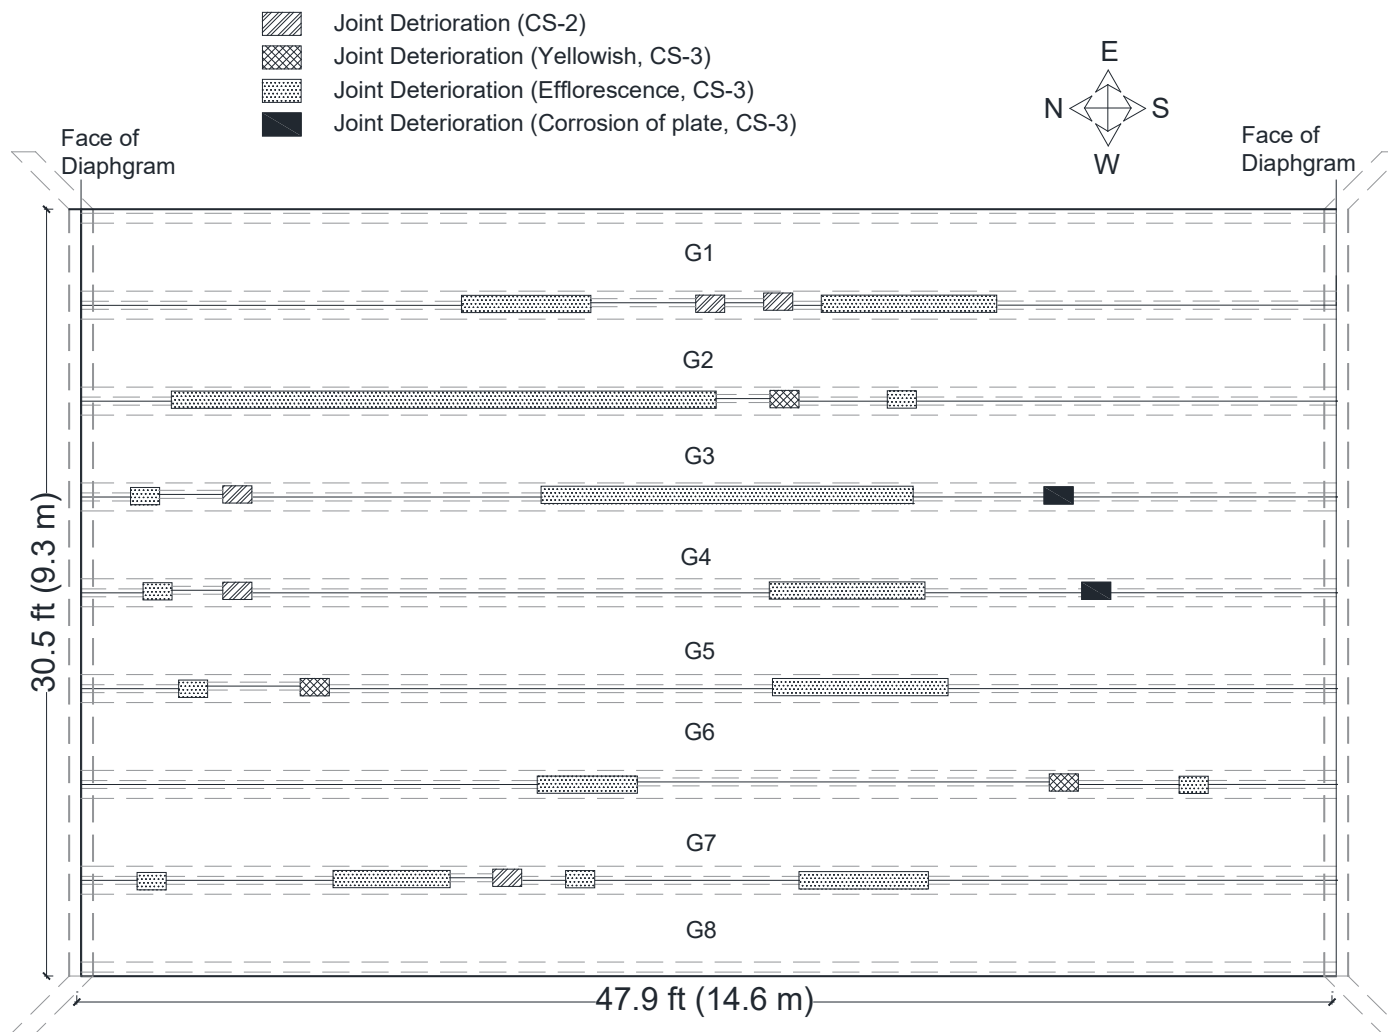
Observed Longitudinal Joint Damage of Field Test Bridge 51-090-012
